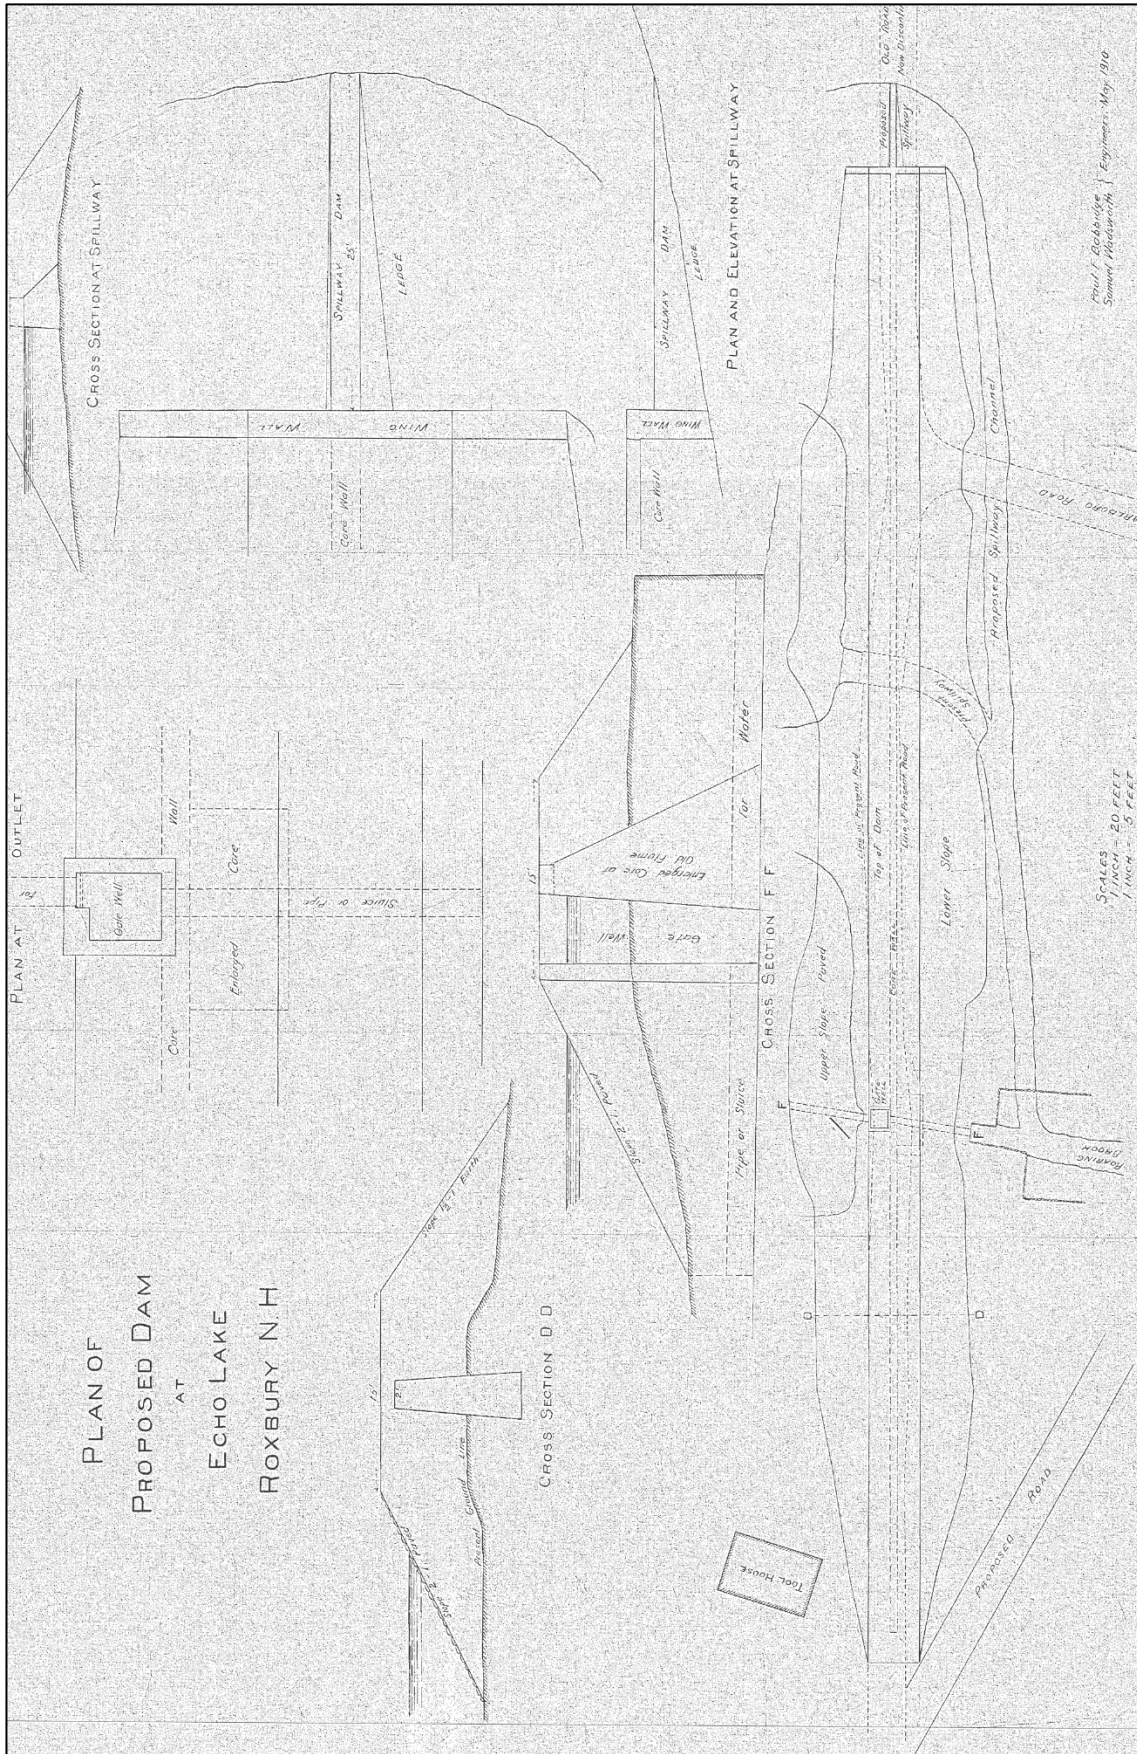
Plan of Proposed Dam at Echo Lake, showing extant "tool house" (Source: Babbidge & Wadsworth 1910).
